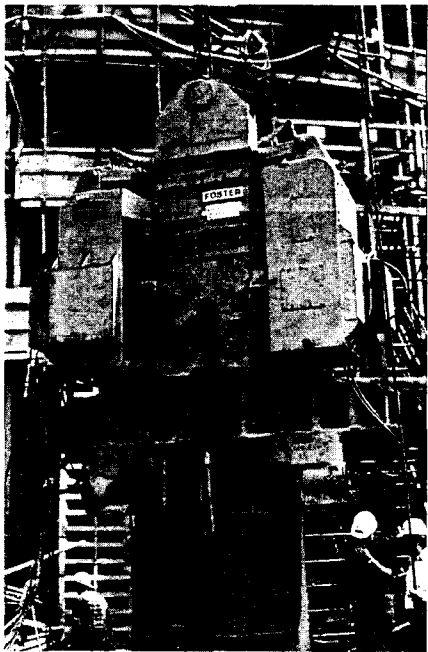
A vibratory pile hammer. This hammer is extracting a steel pipe used as a casing for a drilled shaft foundation (ADSC: The International Association of Foundation Drilling).
